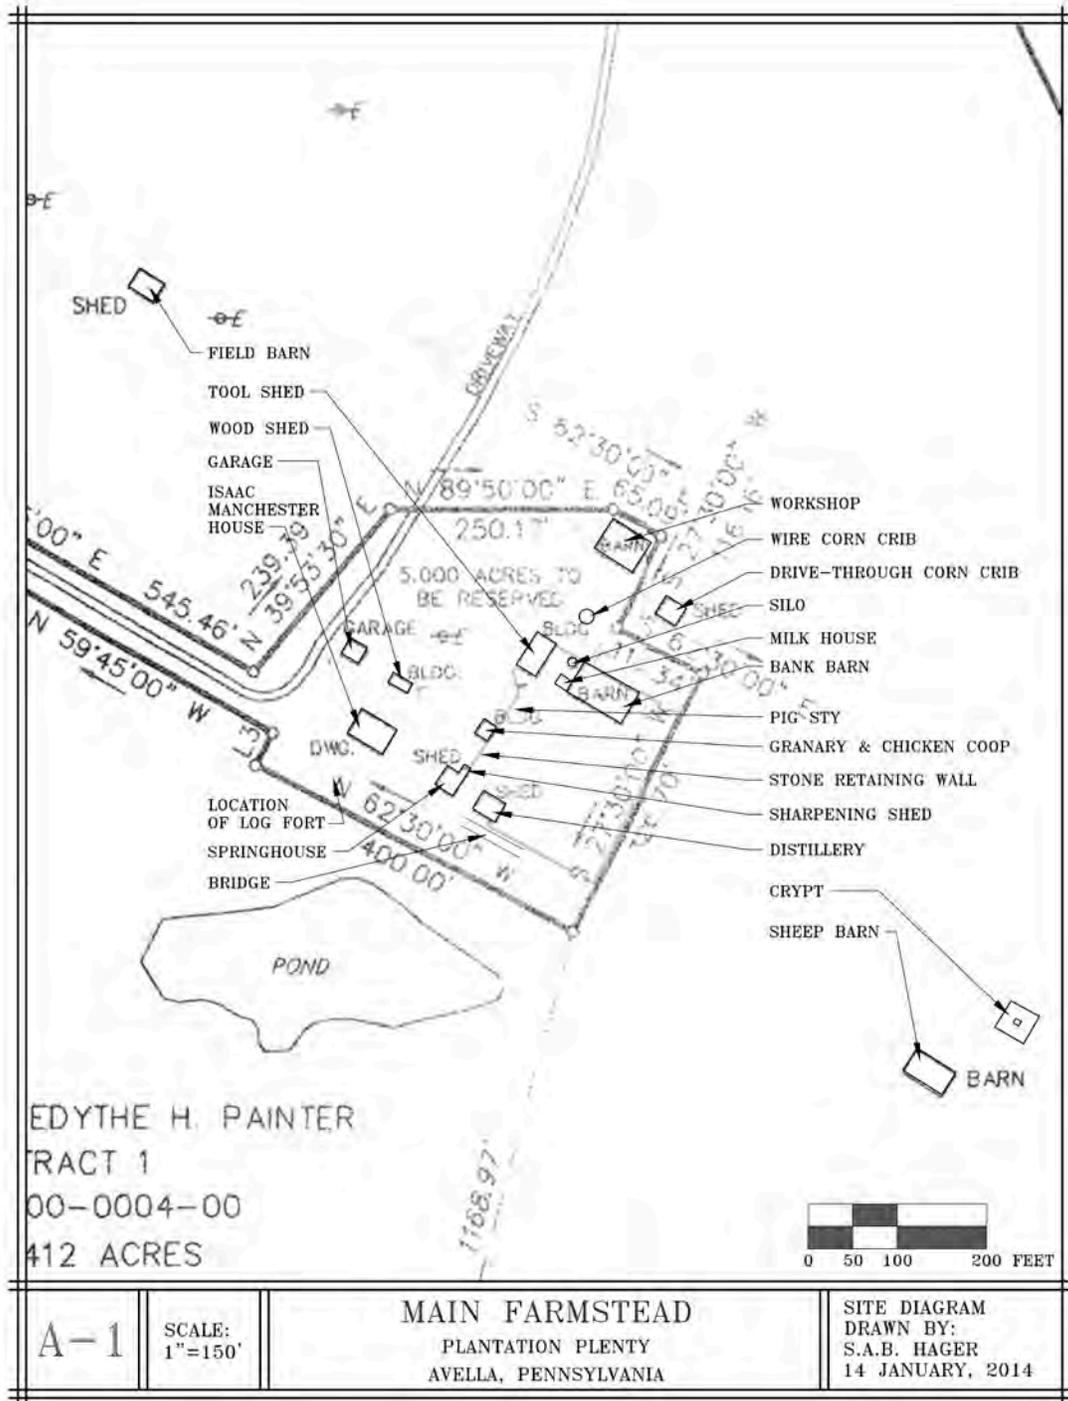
Plantation Plenty Original Farmstead (w/Isaac Manchester House) Detailed Site Plan
